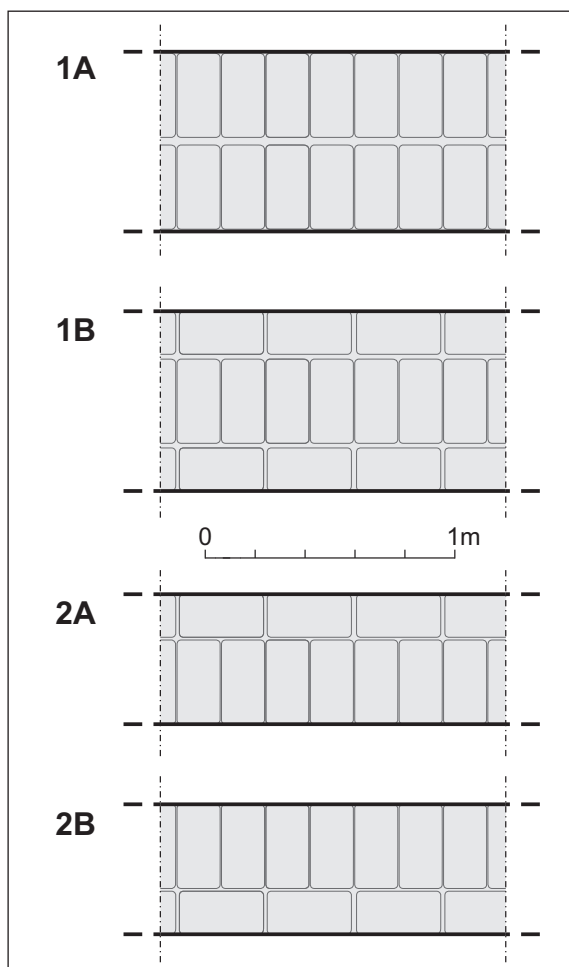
Brick bondwork in alternating courses of the walls of the Pillar Church: 1 A,B – outer walls; 2 A,B – inner walls
